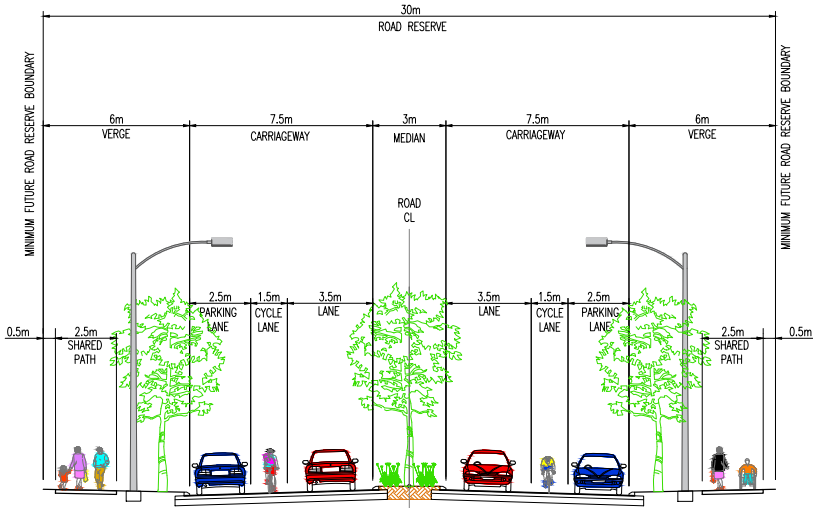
CROSS SECTION OF NEIGHBOURHOOD CONNECTOR A
